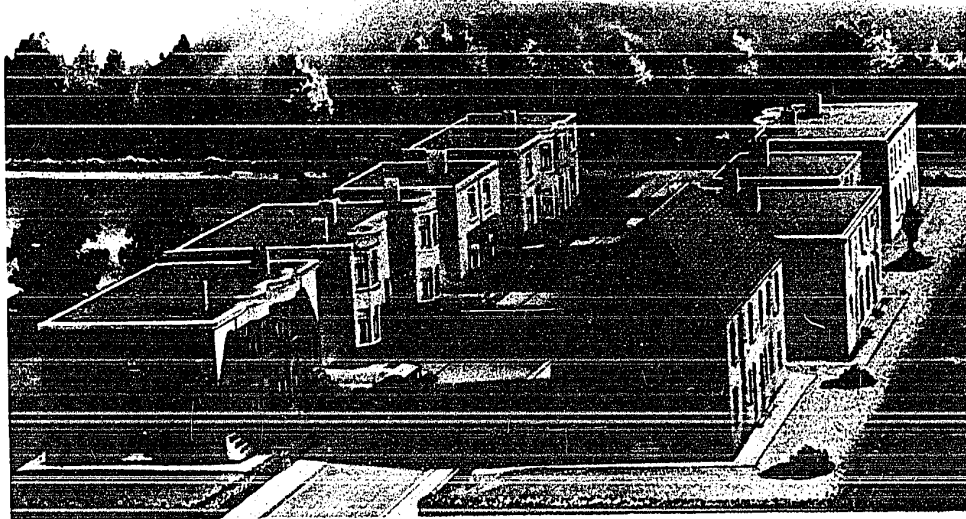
Pitched roof opposite the windows obstruct sunlight and daylight much more than do flat roof.
